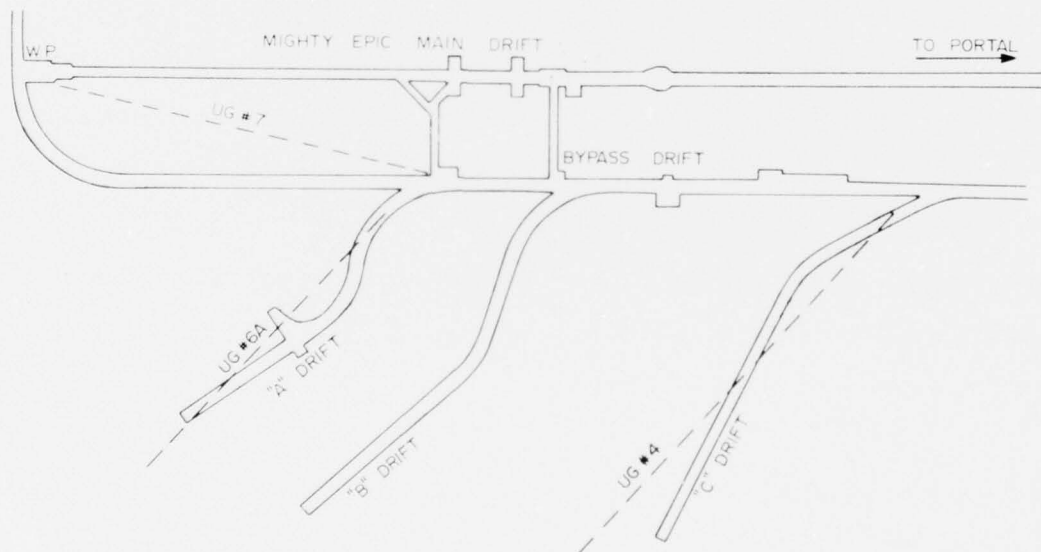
Plan View of the Mighty Epic Tunnels and Selected Drill Holes
